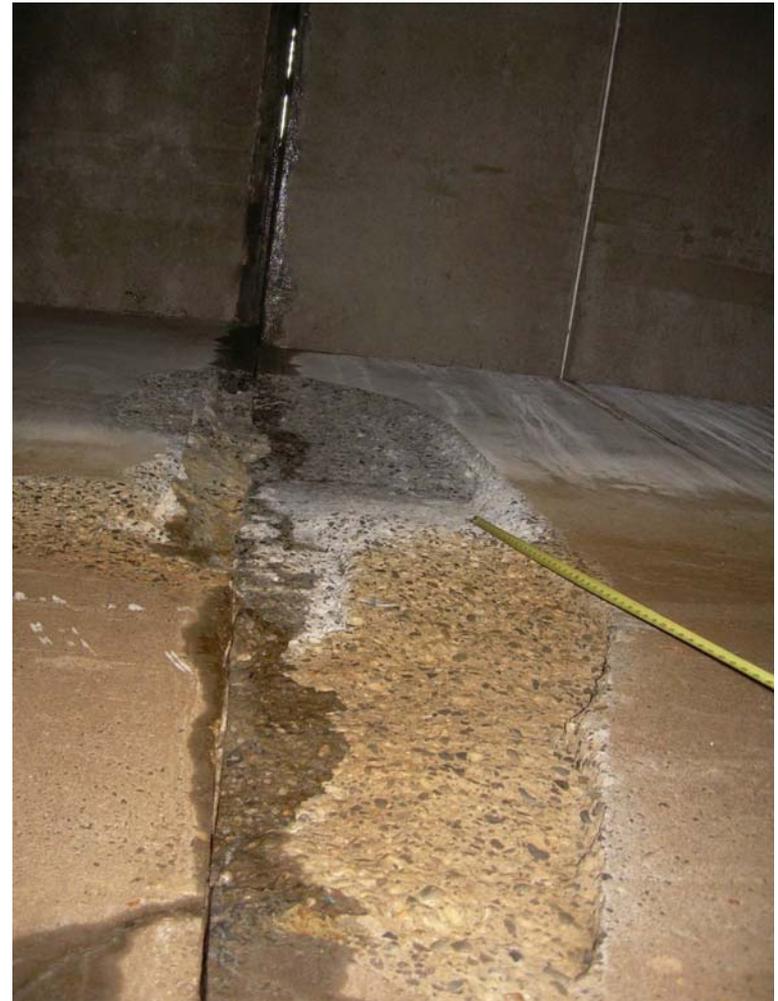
Sta 12+78 right side 48" by 2" deep, left side channel spall in 2 locations, a 4' lower spall and a approx 15' high by 36" wide larger spall
